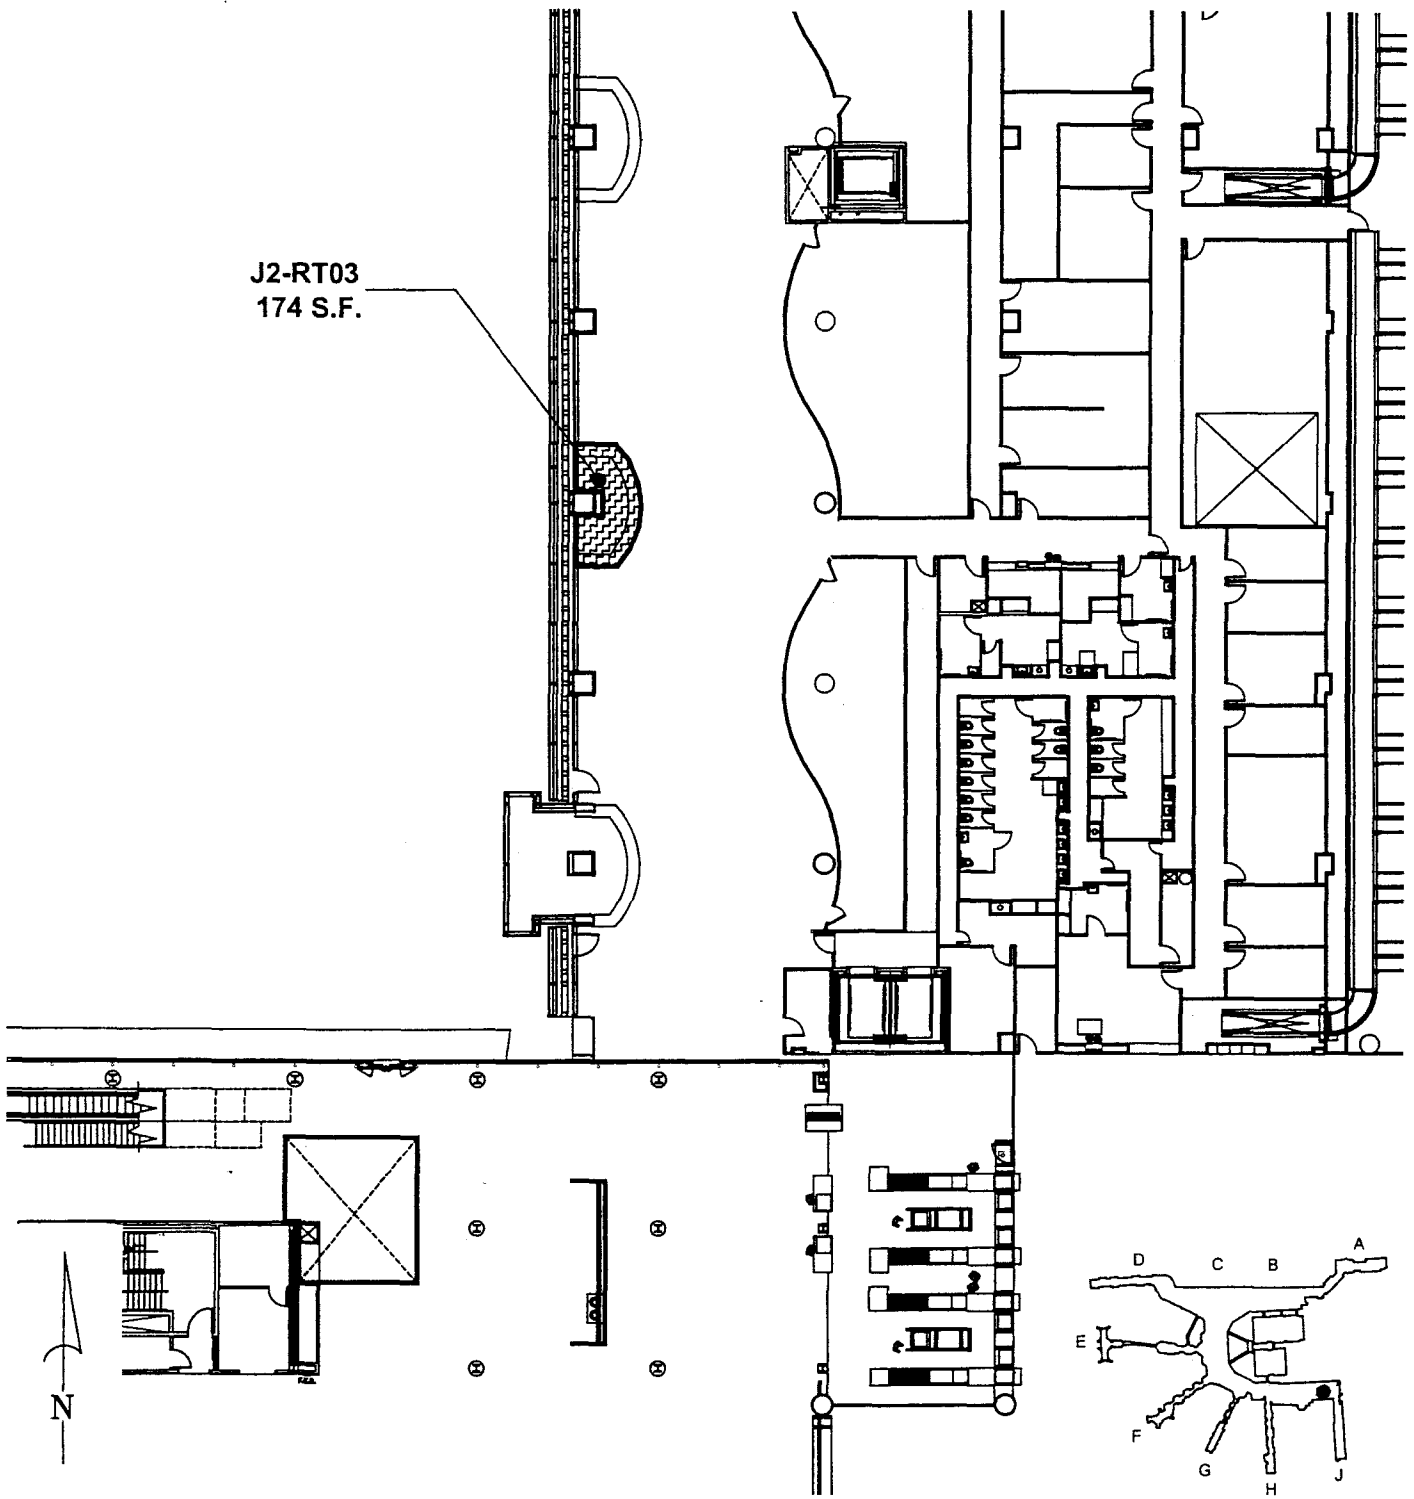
# EXHIBIT A PROPOSED RETAIL CONCESSION ZONE J
